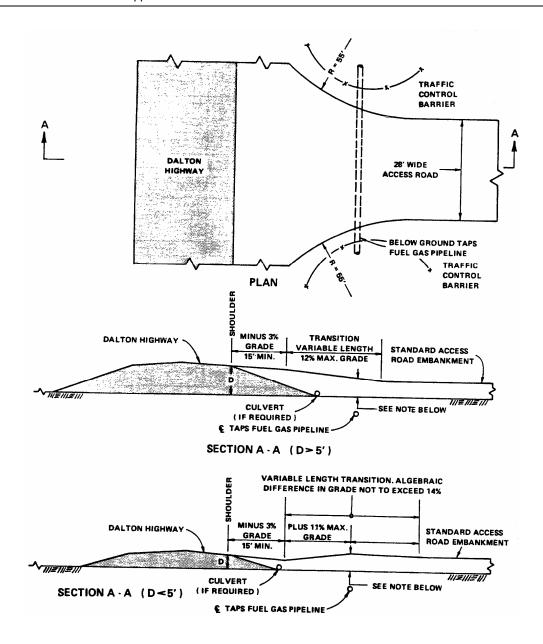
Typical Access Road Crossing For Belowground TAPS Fuel Gas Pipeline Adjacent to Dalton Highway
